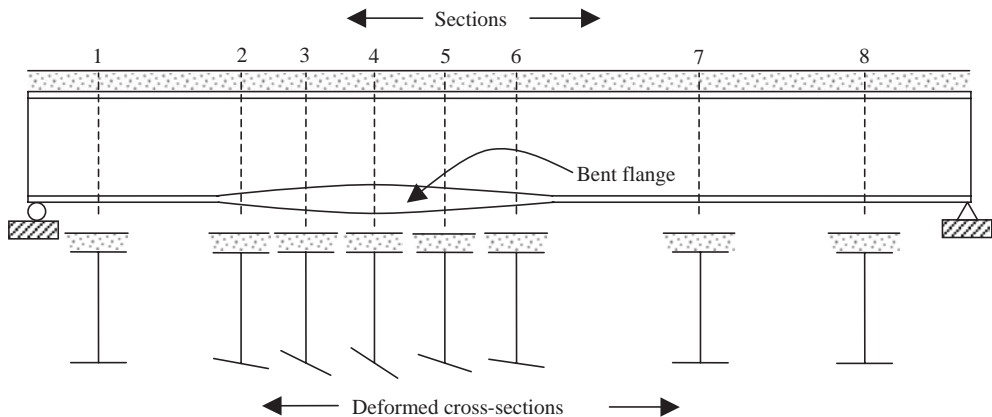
Schematic of hypothetical damaged girder showing bent bottom flange.
